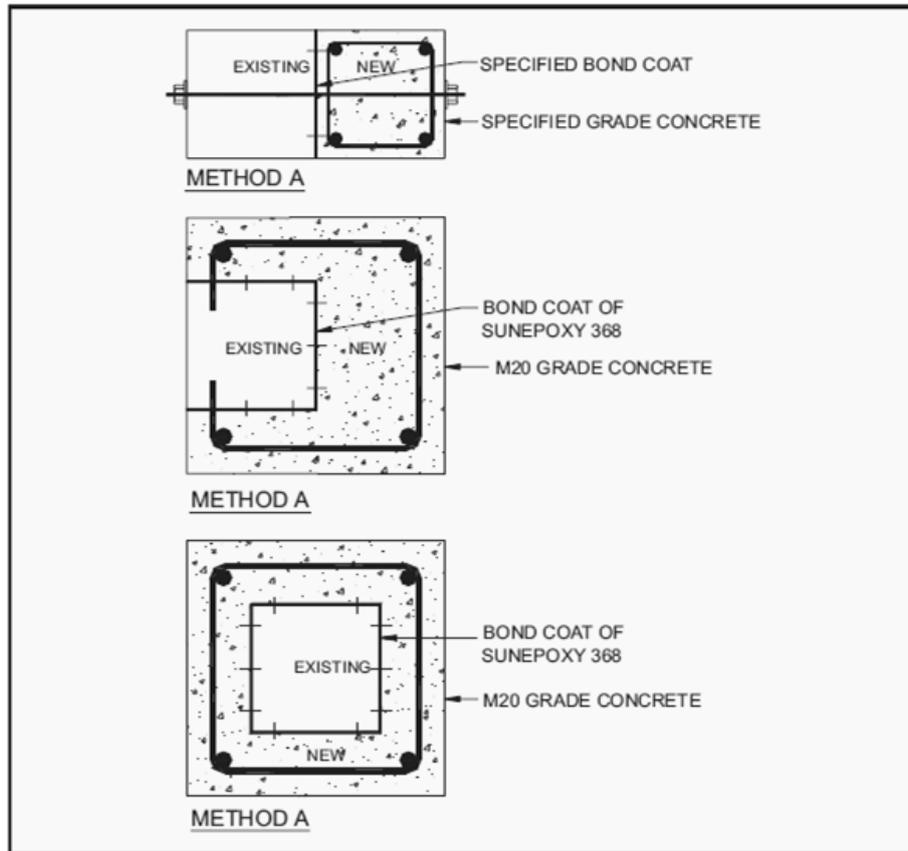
Column Compressive Strengthening by Section Enlargement
